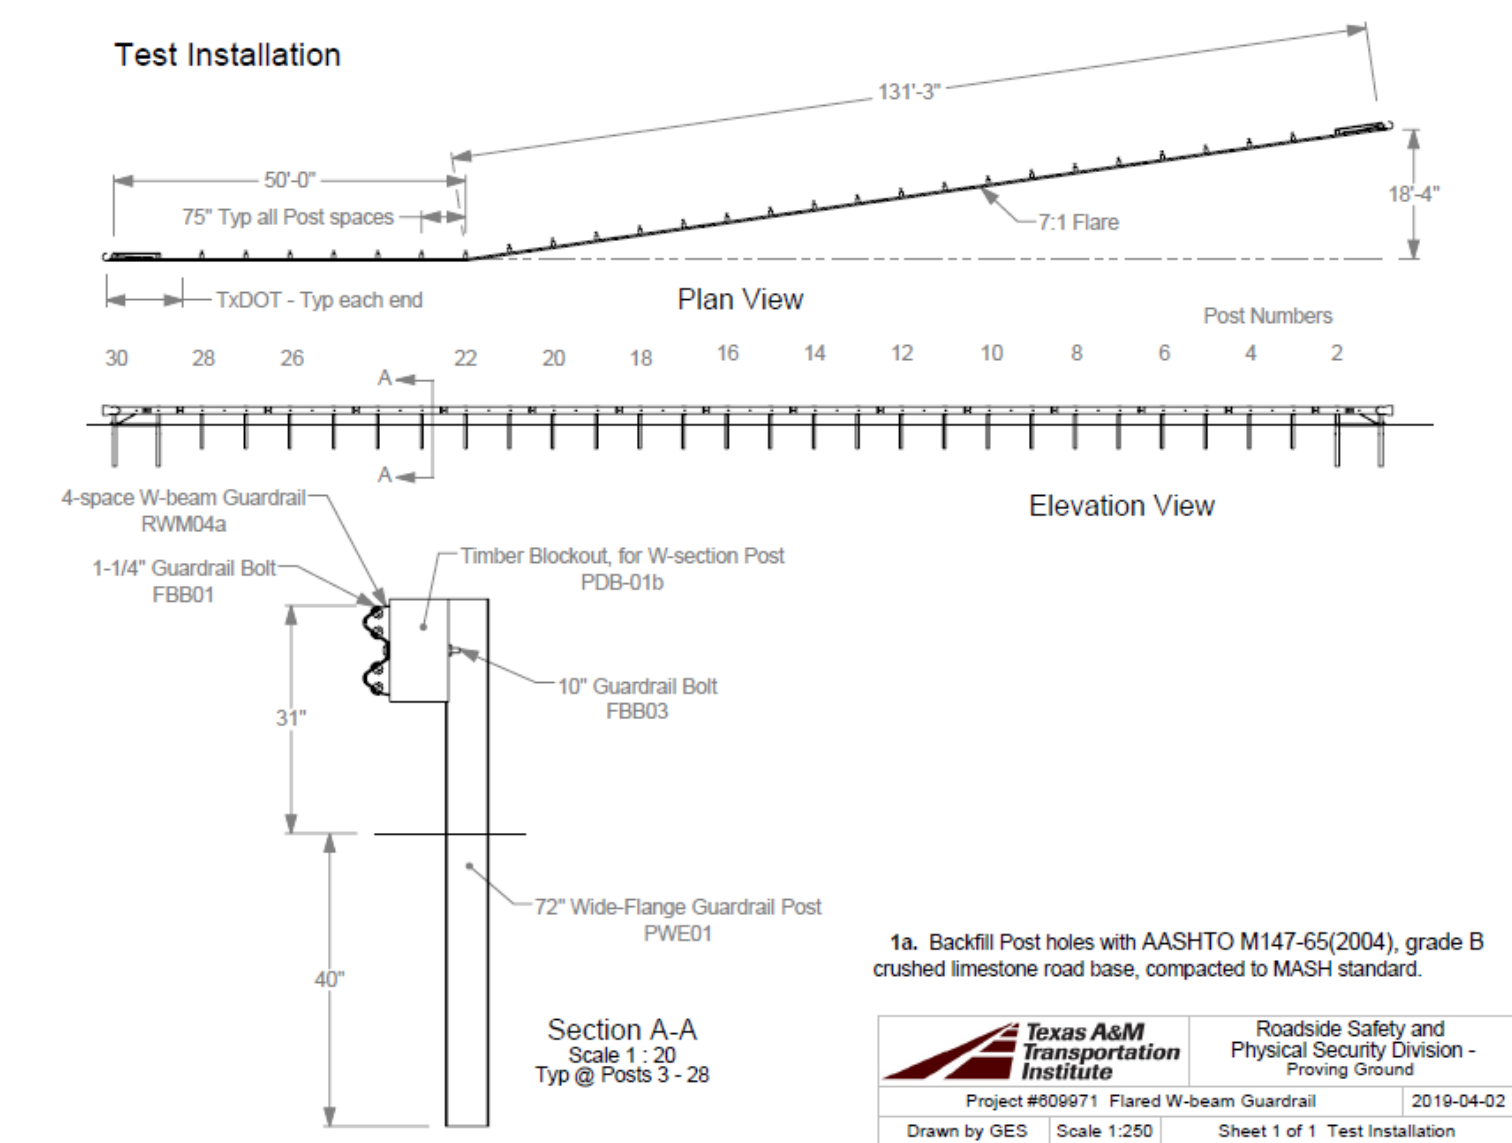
Details of MGS Guardrail with 7:1 Flare.
